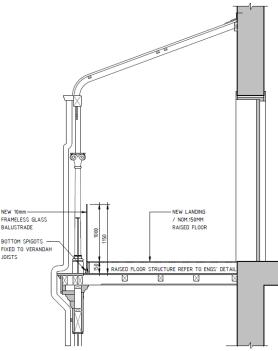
Proposed detailed drawing of the glass balustrade. Source: CCG Architects, 2022.
